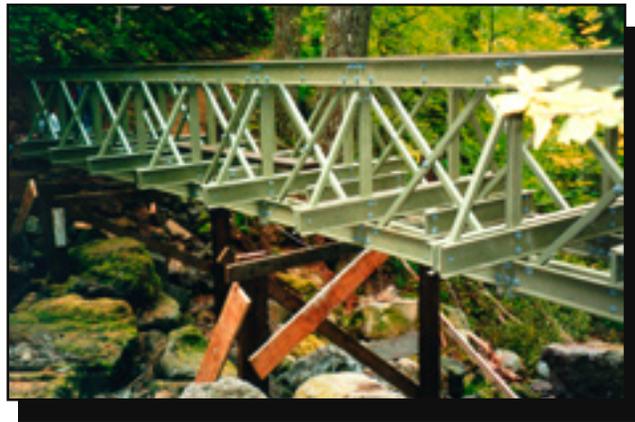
Sometimes, temporary supports must be used when constructing longer bridges.
